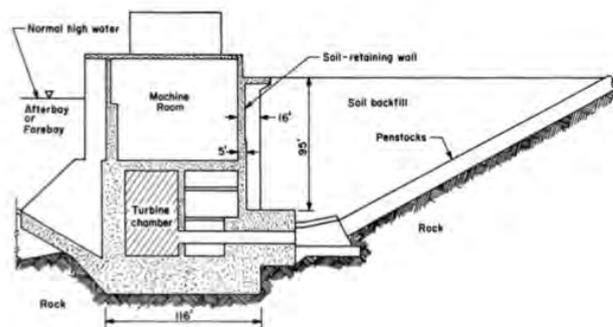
Typical section of Castaic power station. (Dimensions shown in feet. 95' = 29 m)
